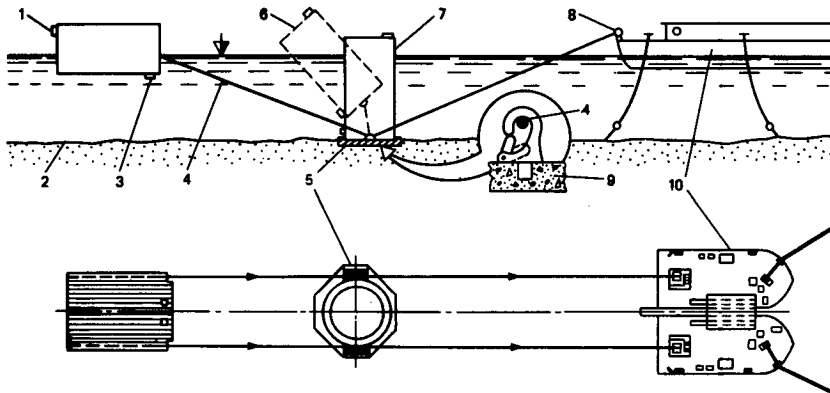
Placing of reinforced-concrete floating column: 1 - air bleeding valve; 2 - river bottom; 3 - kingston valve for water discharge; 4 - two steel cables attached to bottom edges; 5 - concrete pad fabricated in movable caisson; 6 - column being placed vertically; 7 - column in position; 8 - winch; 9 - concrete foundation; 10 - anchored barge.
